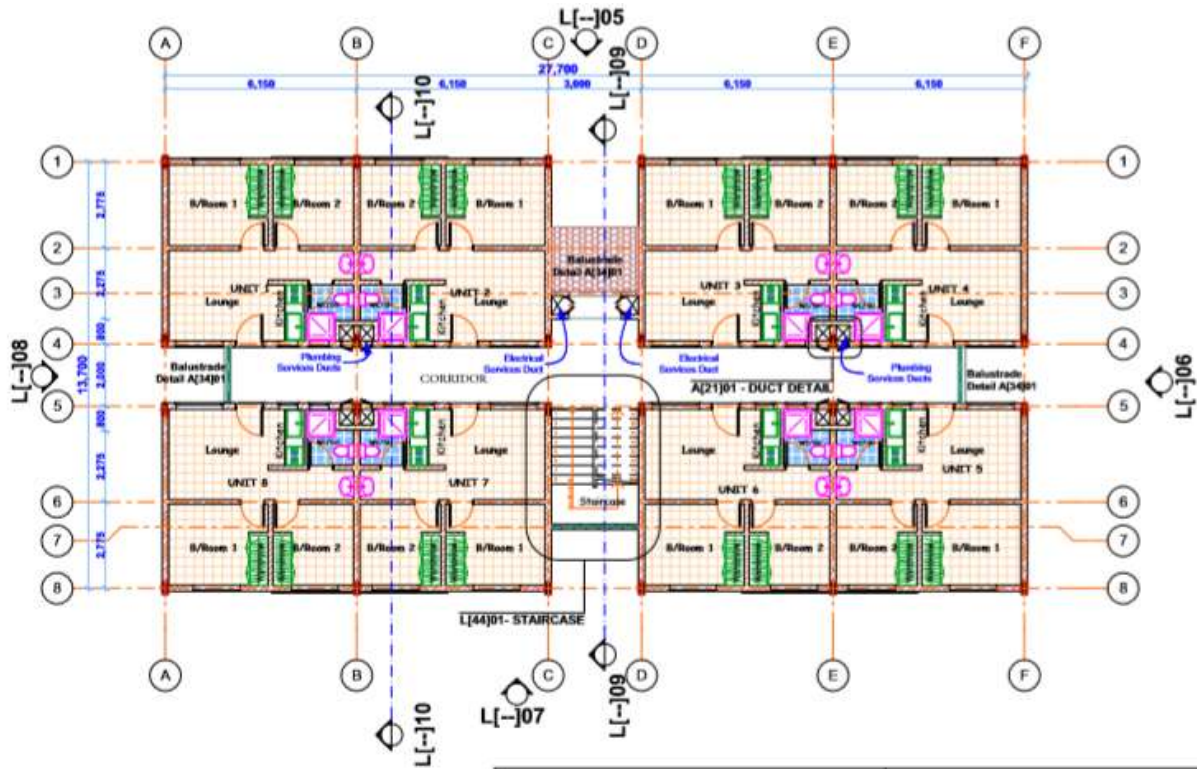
Typical Floor Plan for Levels 1, 2, 3 & 4 of the Proposed Affordable Units
